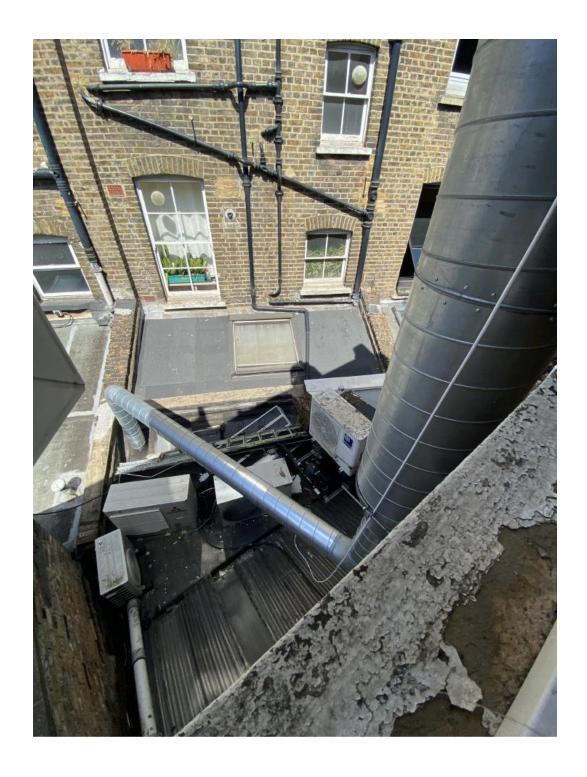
(above): Additional photo taken from the Lamb's Conduit Passage side of the site showing existing plant
